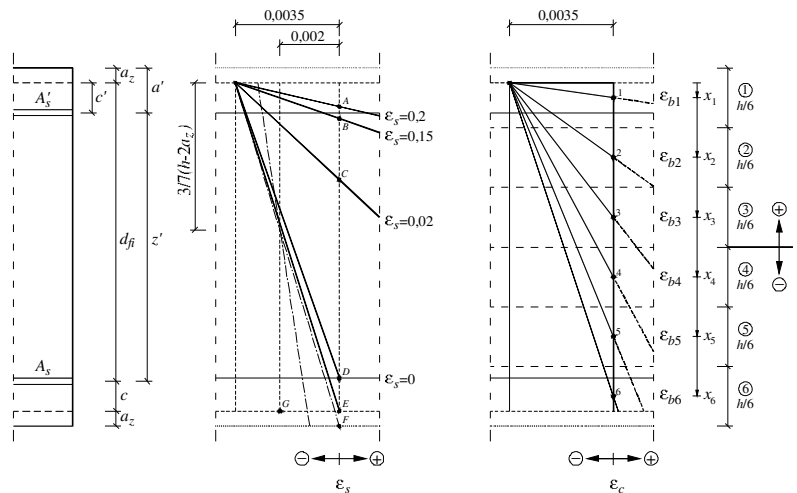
Limit strains in the reinforcement steel bars and in the 6 concrete zones (SimFIRc).
